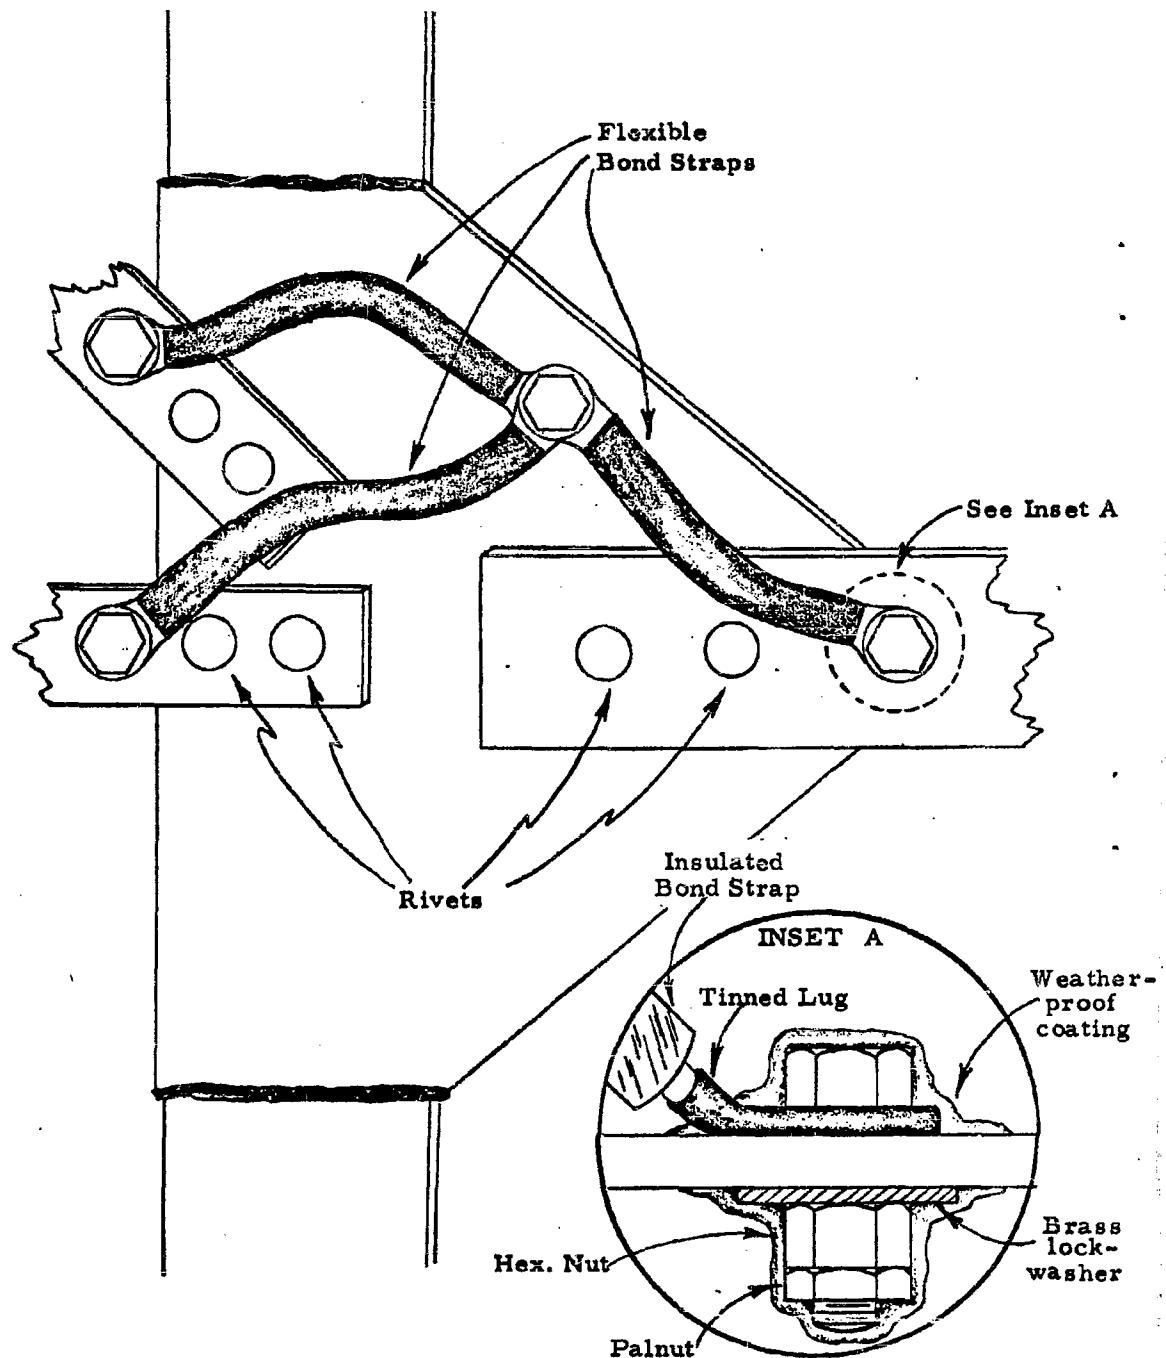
TECHNIQUES FOR BONDING METALLIC MEMBERS CONNECTED BY RIVETS.
